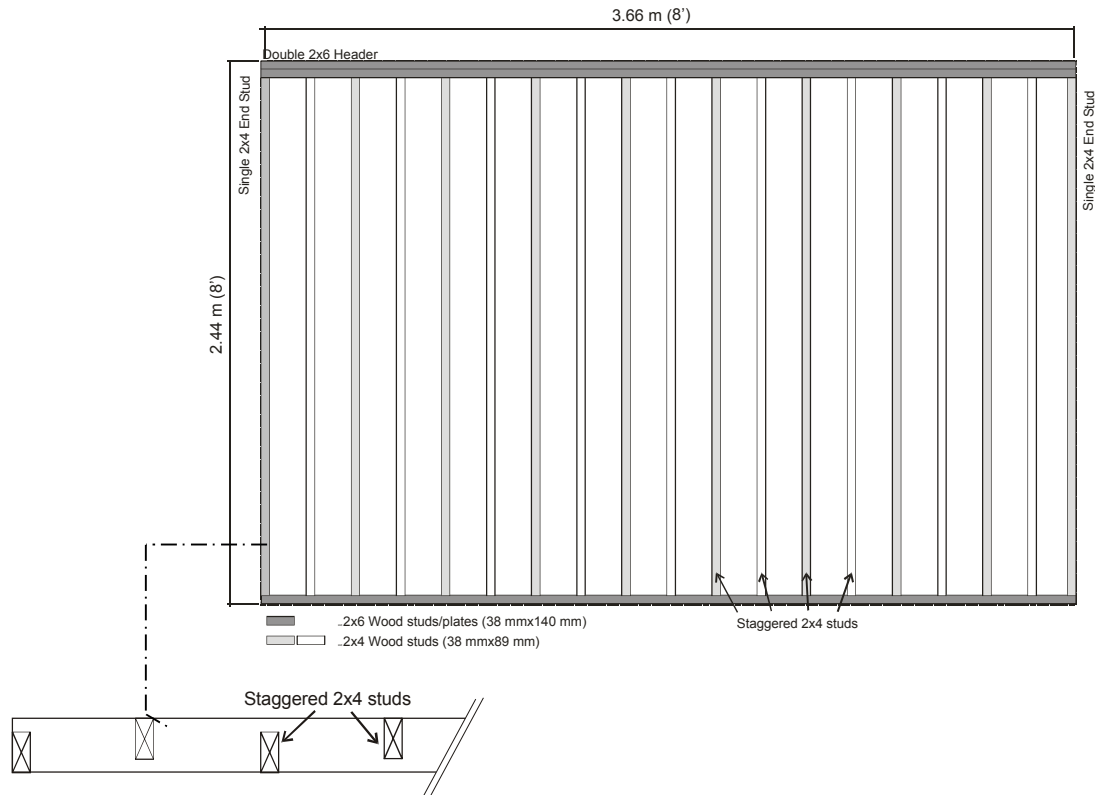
2: Framing details for benchmark 2x4 staggered stud wall with studs spaced 400 mm on centre
